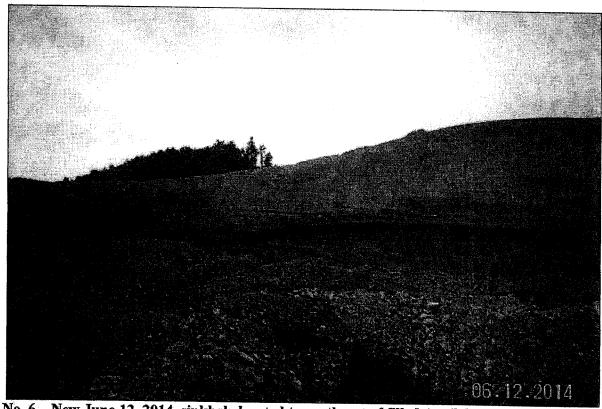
New June 12, 2014, sinkhole located to southeast of filled April 4 sinkholes, note the linear tension cracks possibly associated with large area of subsidence formed on this date. Photo courtesy of Keith Markeson, MSHA.
